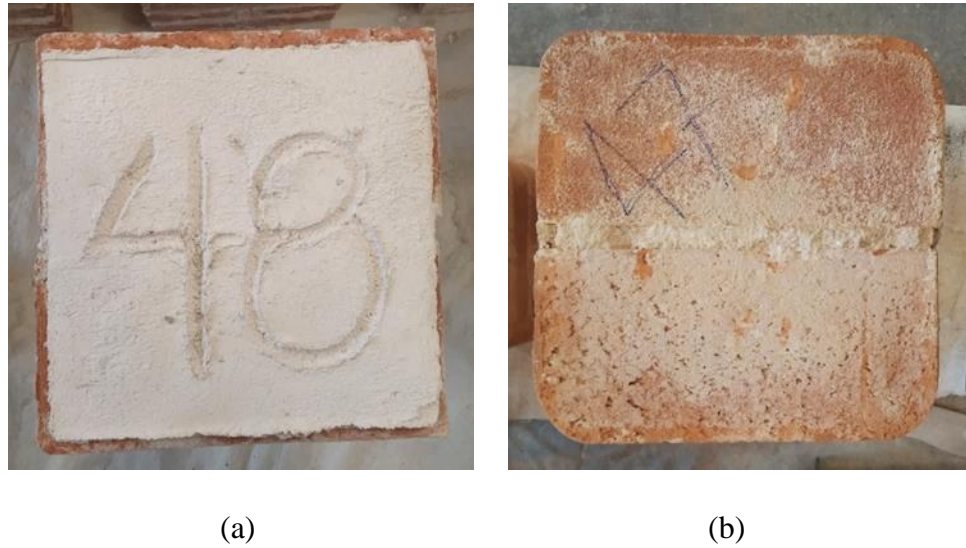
(a) Cross-Section of Specimen with Sharp Corners, (b) Cross-Section of Specimen with Rounded Corners
